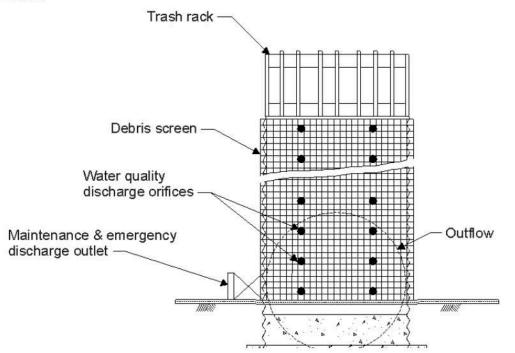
MULTIPLE ORIFICE OUTLET RISER NOT TO SCALE
